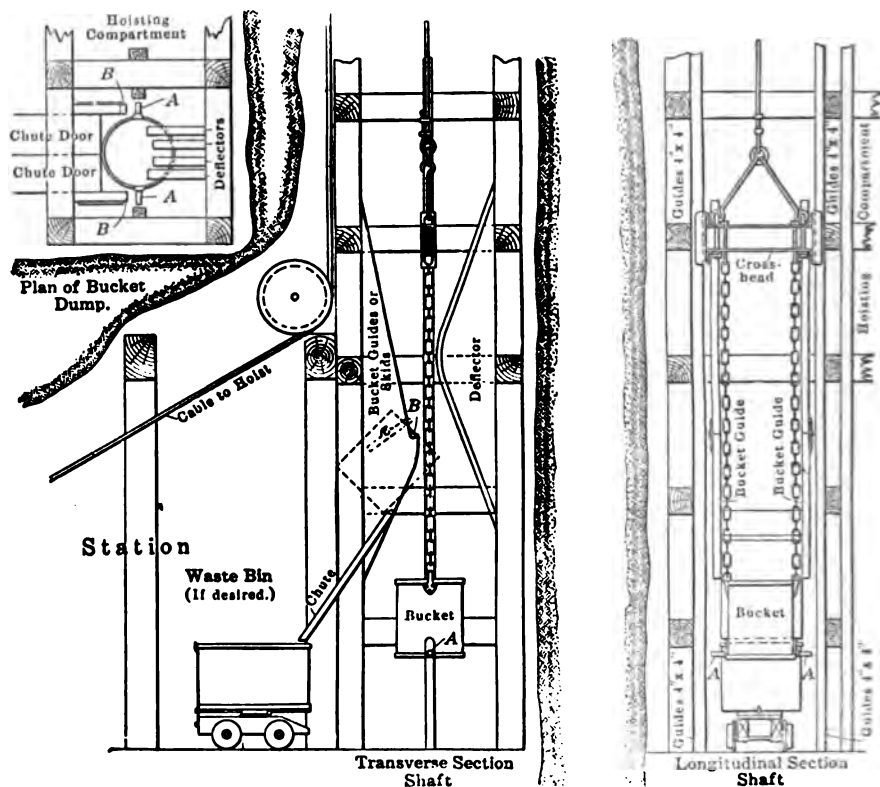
AUTOMATIC DUMPING BUCKET.
